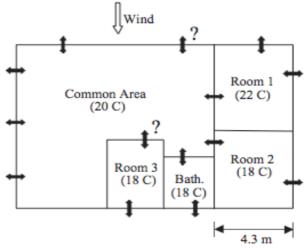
Plan of the five-room building. The arrows represent windows or doors; question marks indicate unknown open or closed status.
